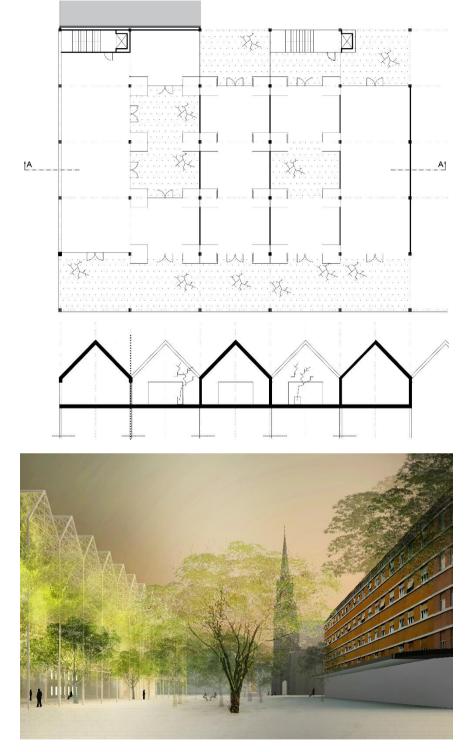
Plan and section of rooftop (source: authors); 3d view of the building in the context, spring (source: Kabinet 505, competition entry [13] – authors are members of the Kabinet 505 team).
